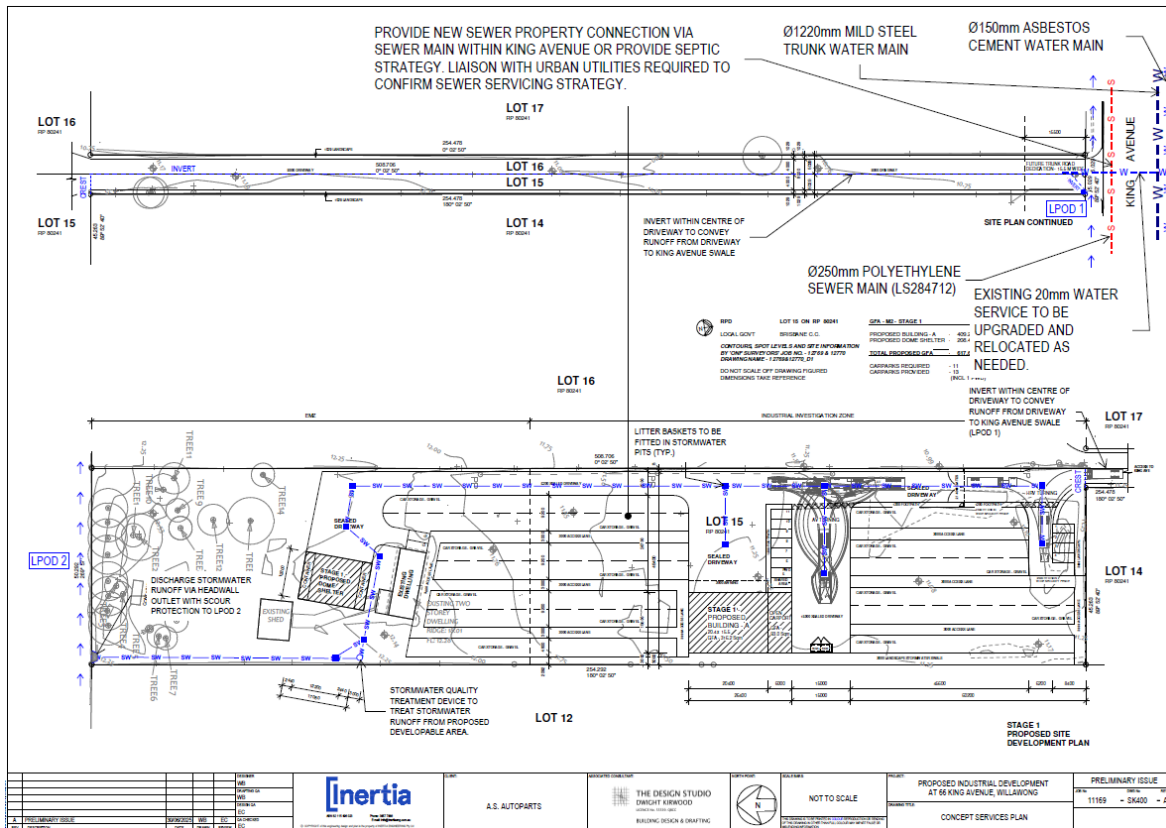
Proposed Stormwater Management Plan – Inertia Engineering
